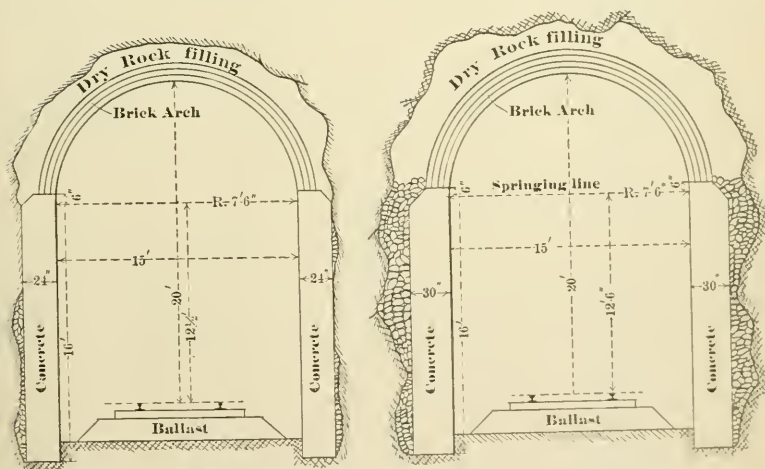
MINIMUM SECTION. FIG. 4.—AVERAGE SECTION.
